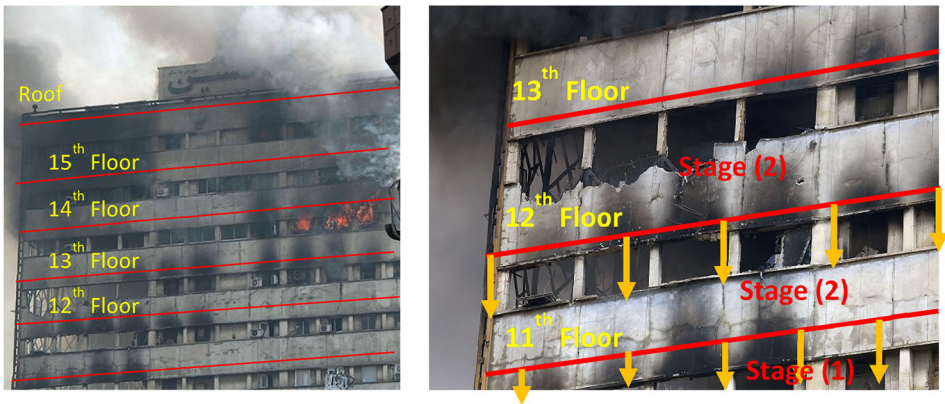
Closer view of west elevation of the building after first and second stage of collapse.
